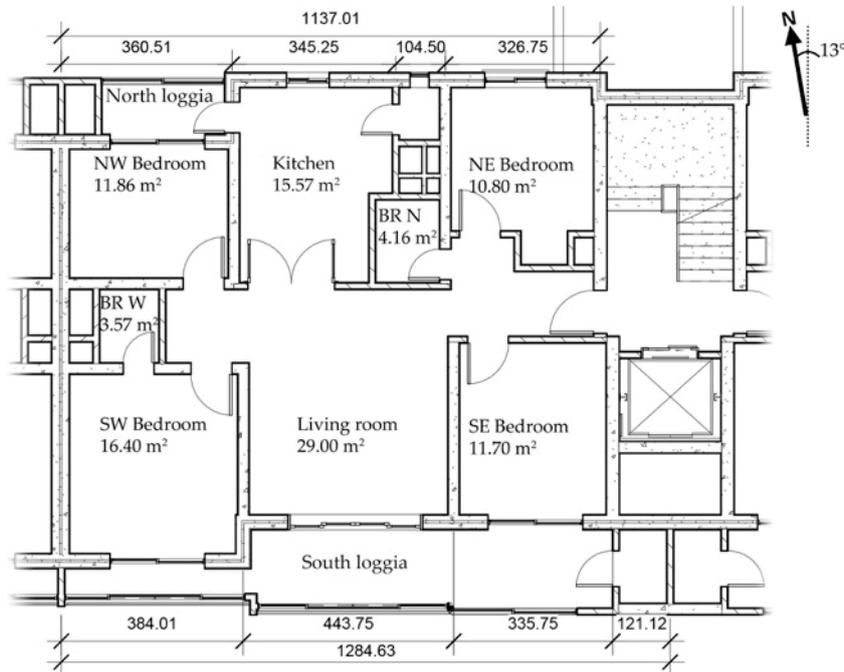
BIM reconstruction of the standard apartment unit in building 103 with indication of each room floor space (left apartment unit in the middle core—dimension annotations in cm).
